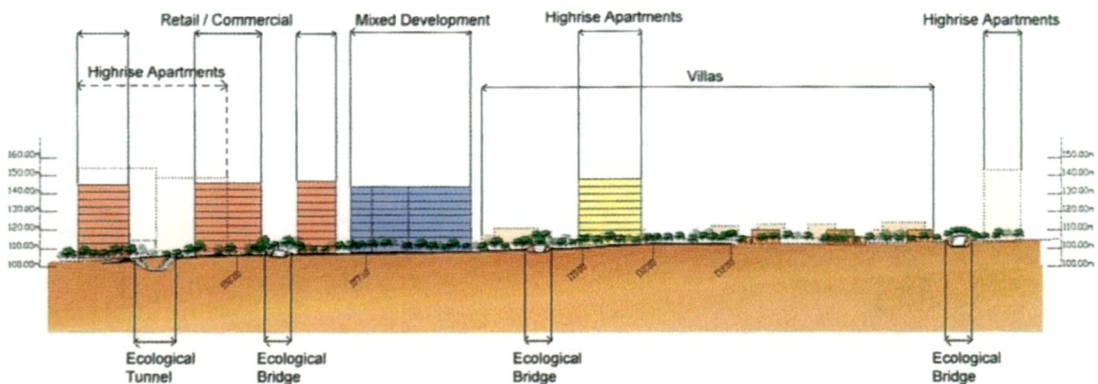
Section showing Ecological Bridges and Tunnels – Soma Masterplan
